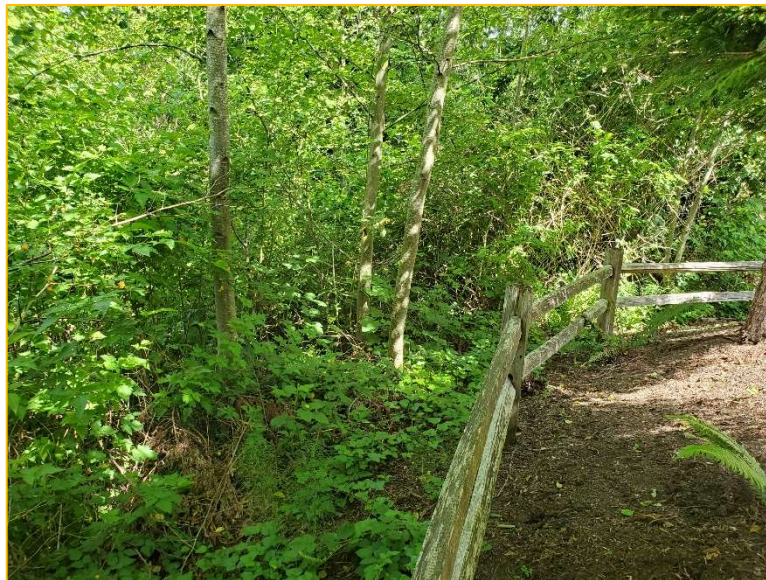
Facing west from the west side of Hargreaves Pl. Runoff continues west through existing tightlined system.
